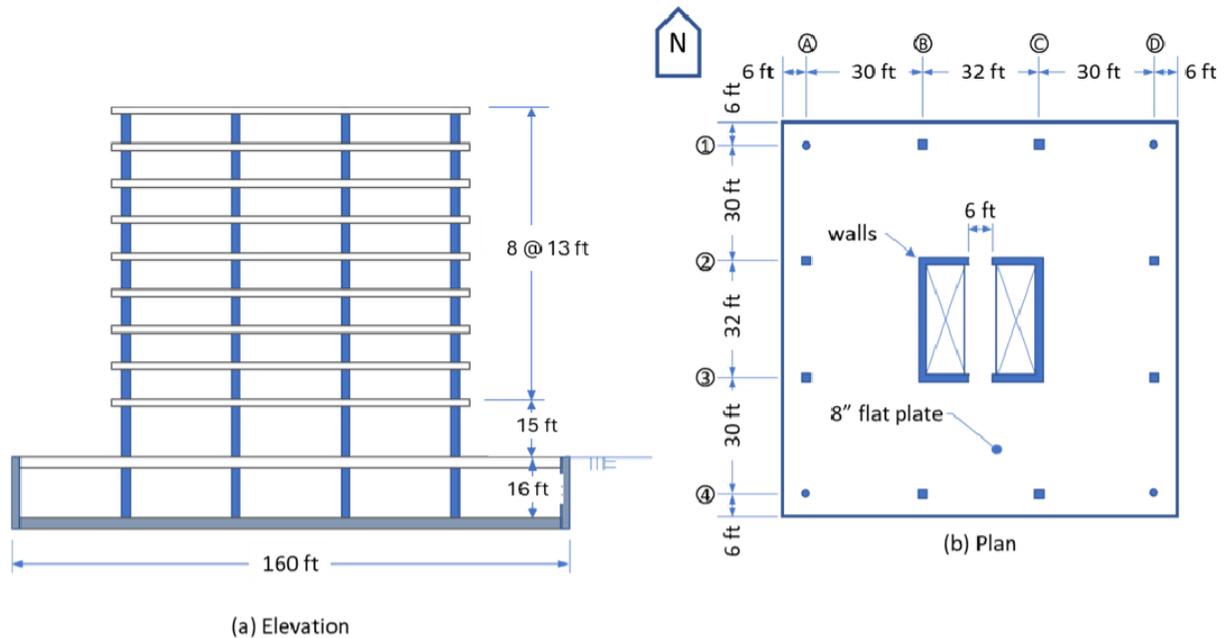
(a) Elevation and (b) Typical Floor Plan View.
